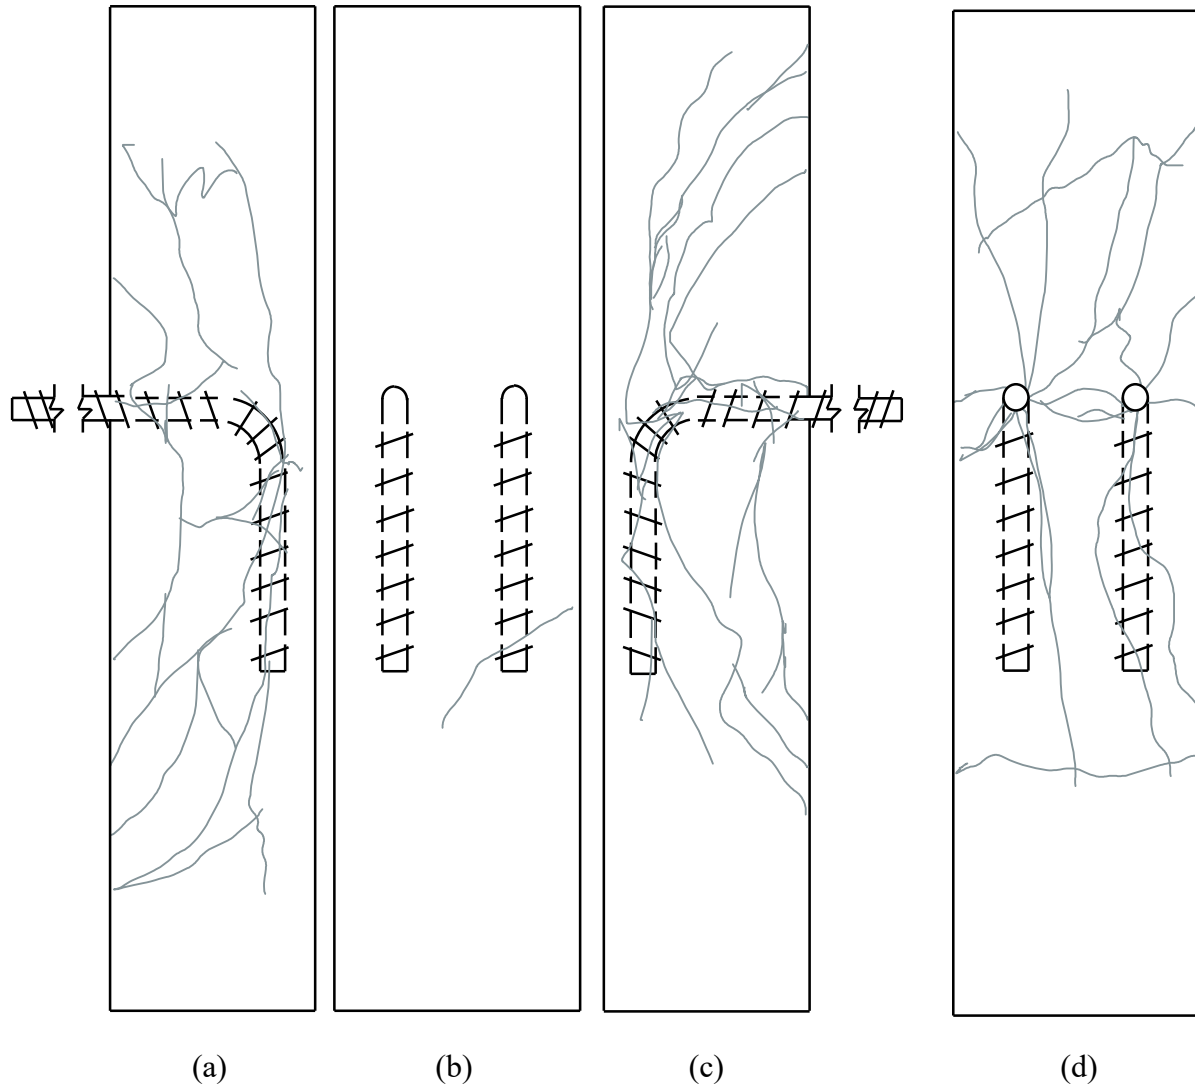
Crack pattern at maximum normalized tensile load for beam-column joint specimen MD5-90: (a) west side face, (b) back face, (c) east side face, and (d) front face
